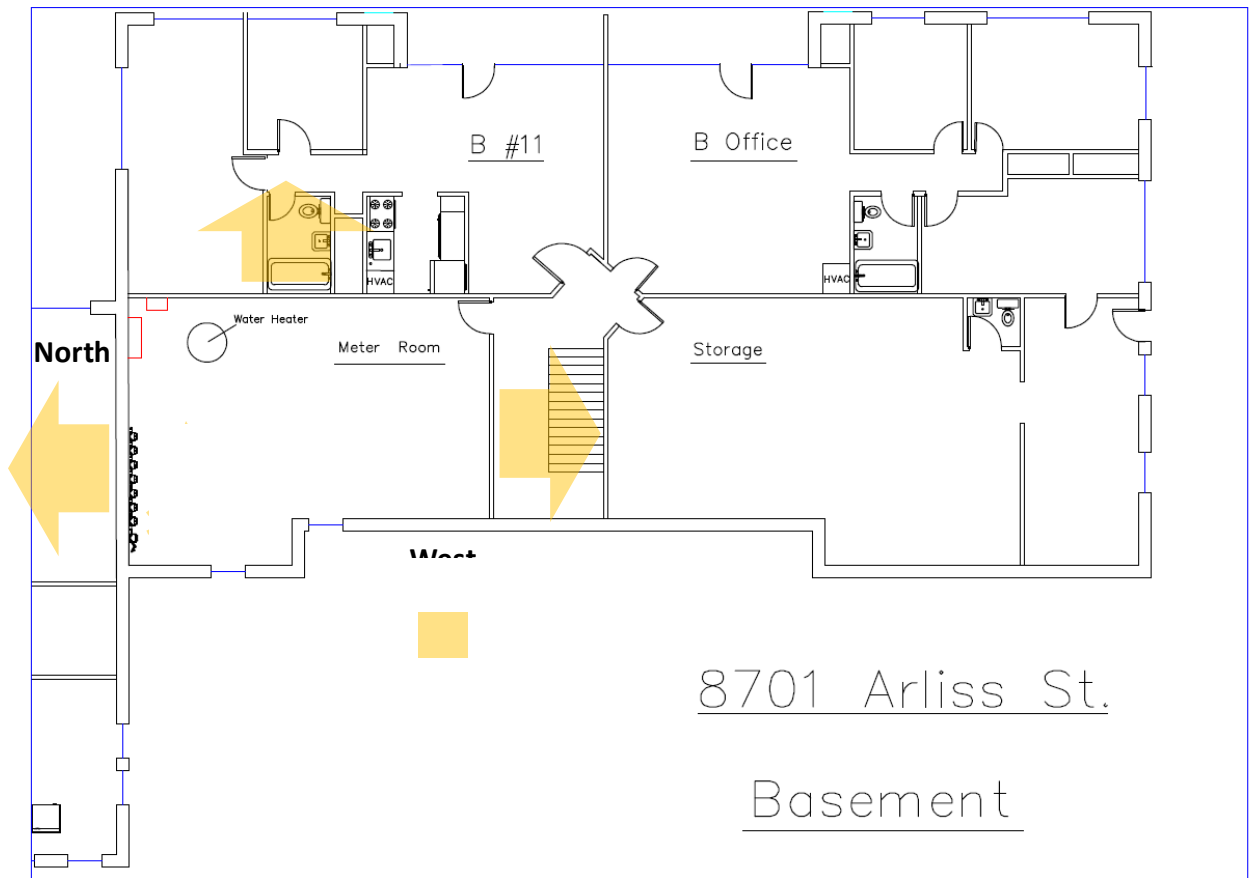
Plan-view diagram showing the configuration of the basement-level rooms at the 8701 Arliss Street apartment building and blast direction evidenced by building damage.
